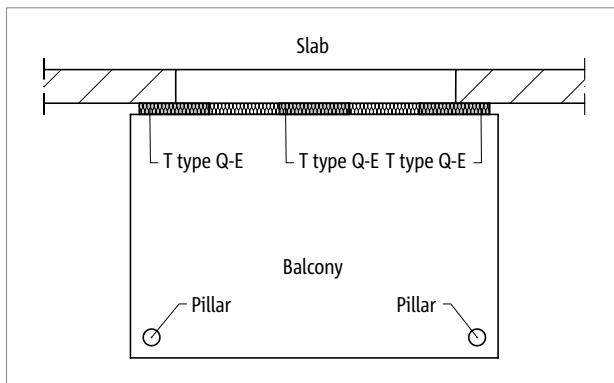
Schöck Isokorb® T type Q-E: Balcony with pillar support
